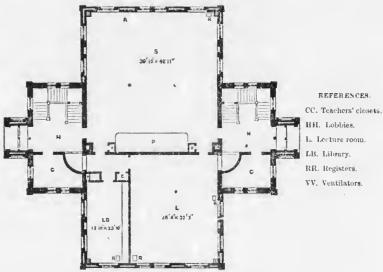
Plan of First Floor or Second Storey, adapted to Fig. 192.
